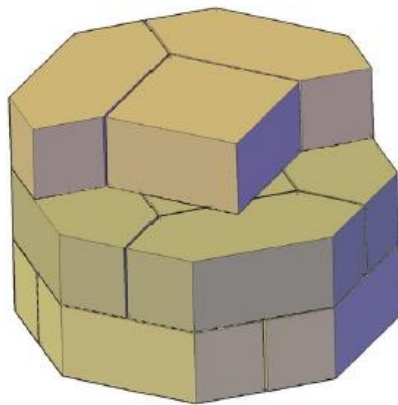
Arrangement of stone blocks in octagonal piers (Caballè et al., 2008)
